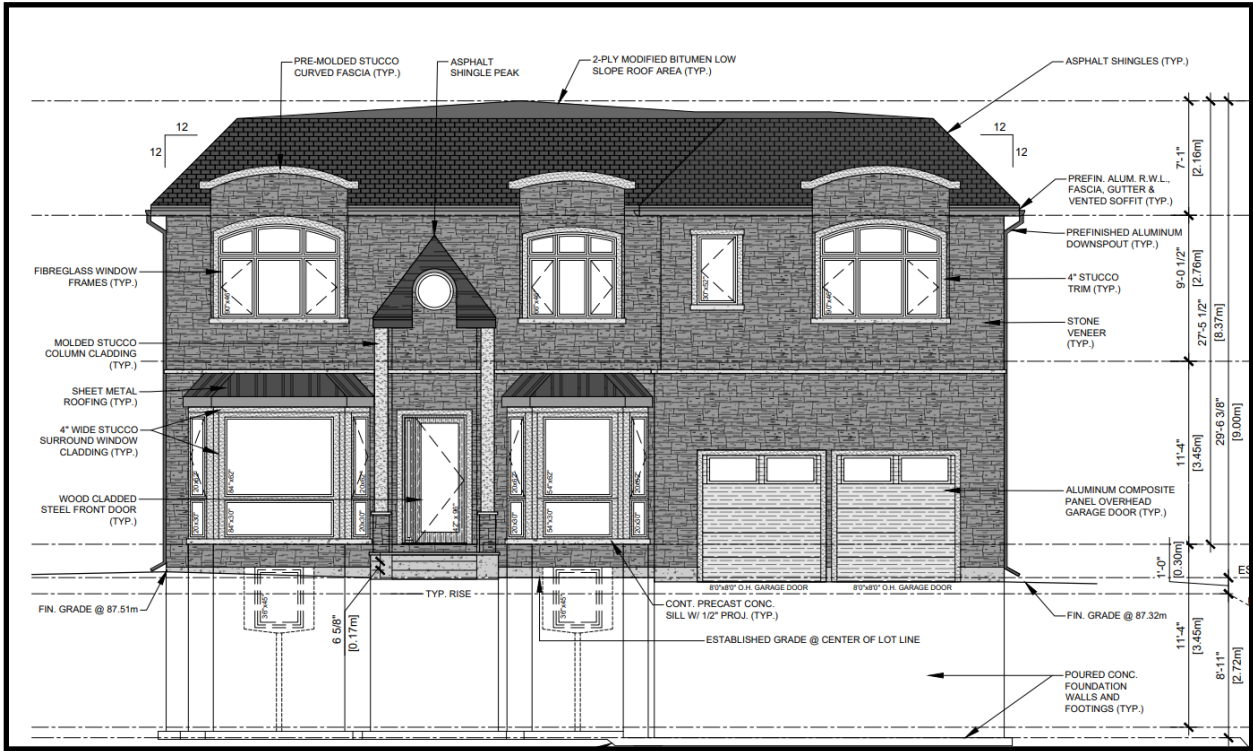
Previous Front Elevation Drawing – February 5, 2025
